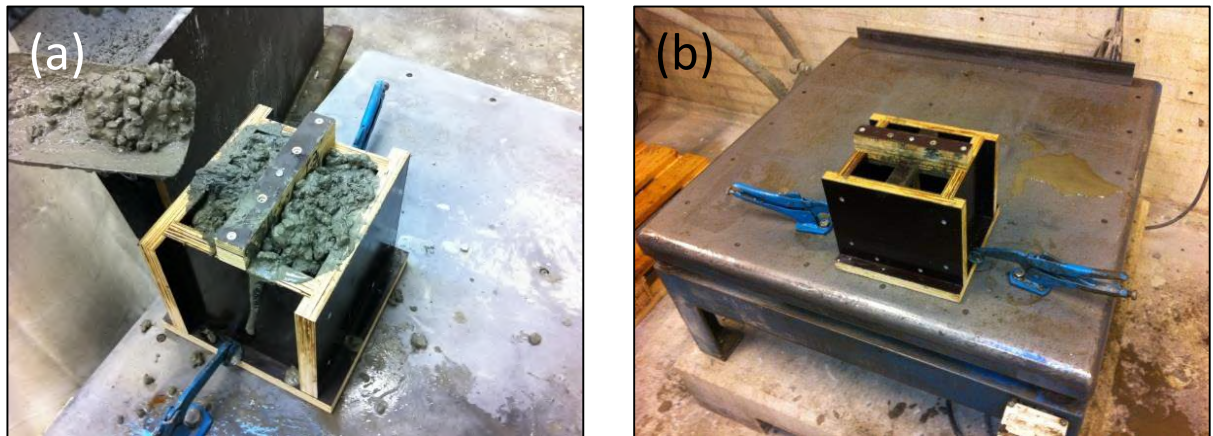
(a) Casting of concrete specimen in plywood mould. (b) Vibration table used for compaction of the concrete specimens. The mould was held firmly against the table by two clamps.
